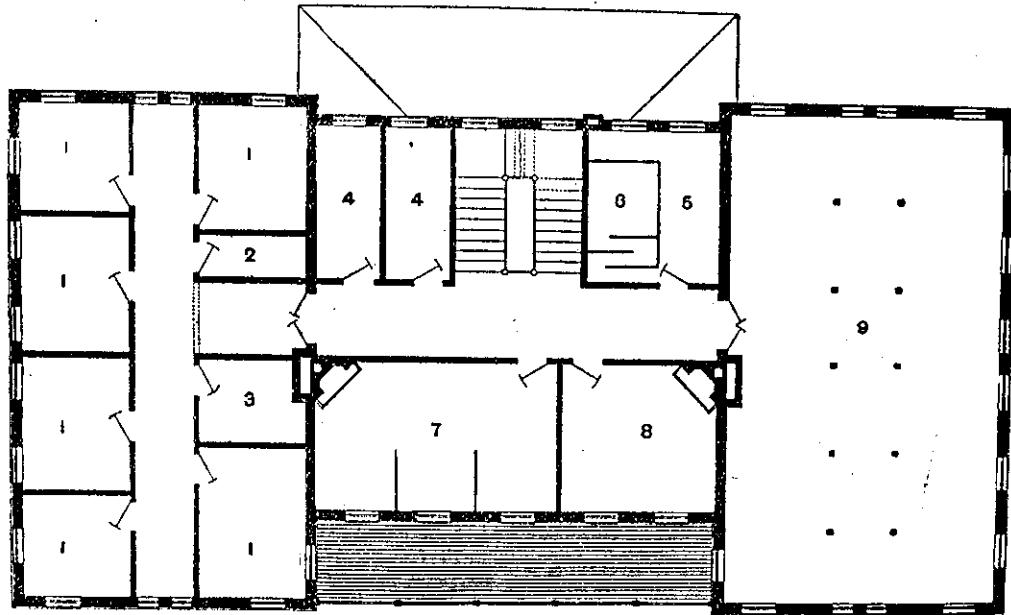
Plan of second floor of laboratory building. 1, Six bed chambers; 2, linen closet; 3, janitor's closet; 4, two bathrooms; 5, photographic room; 6, dark room; 7, north laboratory; 8, director's laboratory; 9, west wing.
